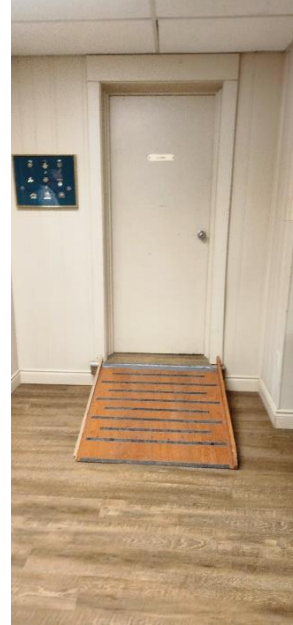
23 – Door to Lobby from Rear Meeting Room
